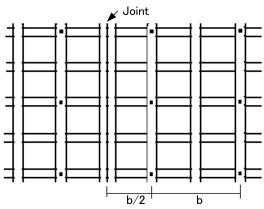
Sketches of composite frame with vertical joint for slope protection
